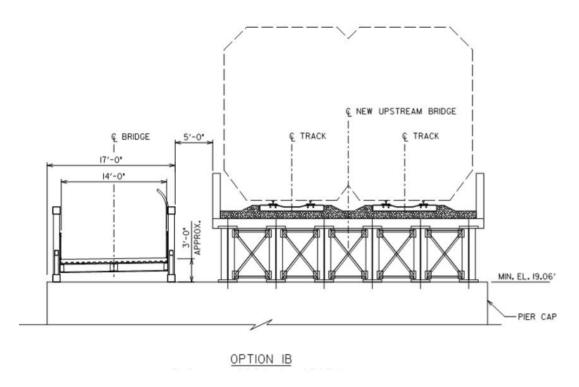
| Section of New Upstream Railroad Bridge and Bike-Pedestrian Crossing Option 1B
